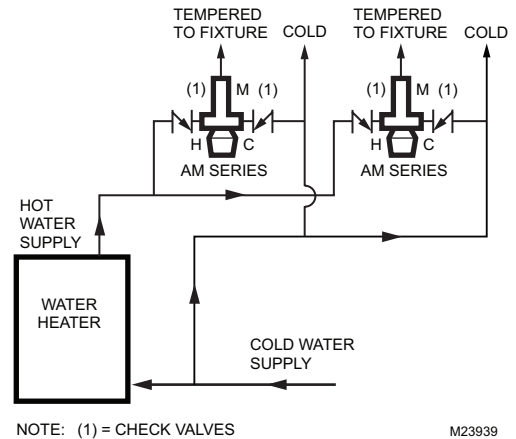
AM Series ASSE 1070 - Two Handle Fixtures
